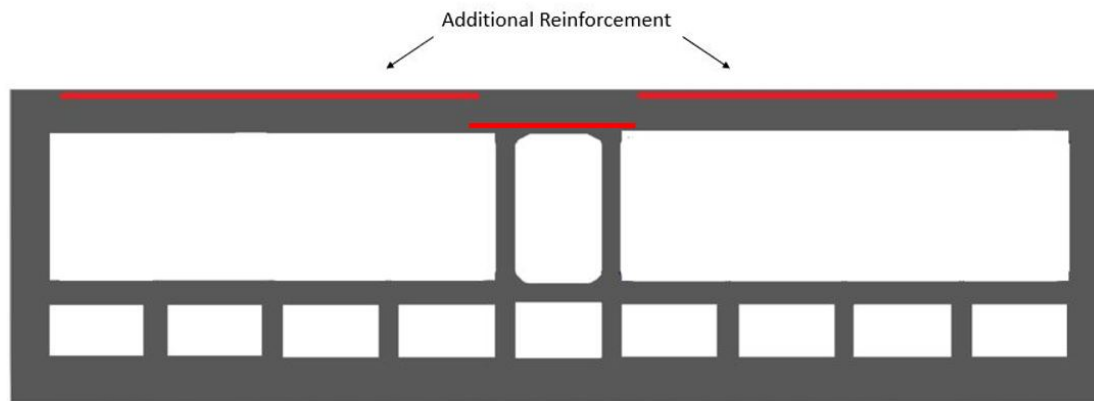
Location of additional reinforcement placement for the Fehmarnbelt tunnel
